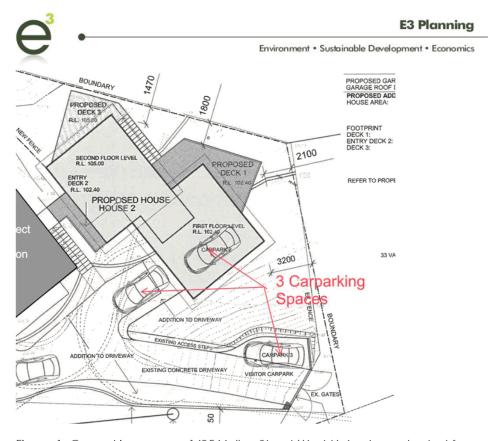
Carparking spaces 1/35 Valley Street West Hobart as adapted from Brian Pigden Drawings 35 Valley Street West Hobart.
